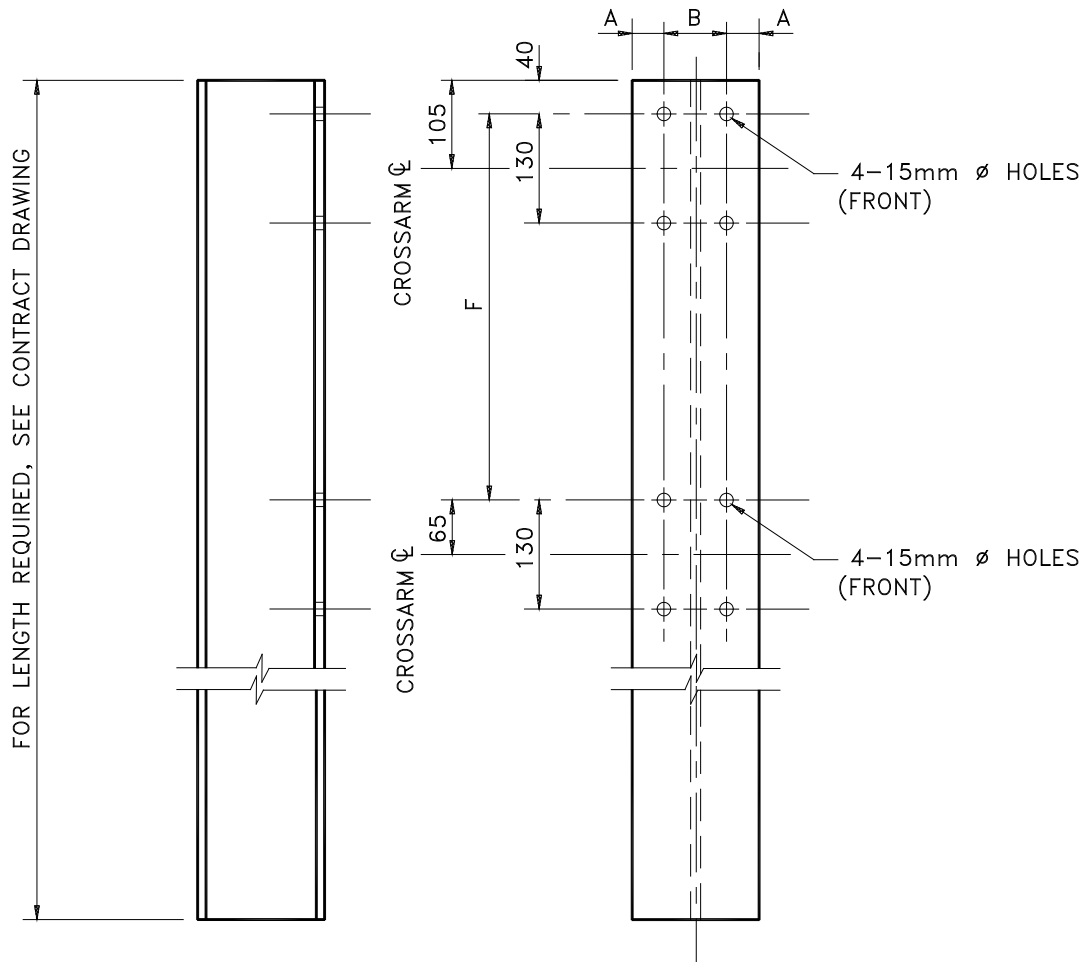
(a), (b) and (c) provide all information necessary to fabricate the columns for non-breakaway steel column sign supports.
